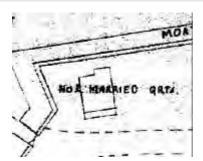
Site plan outline of building in 1939. NAA SP857/3 PC/397
